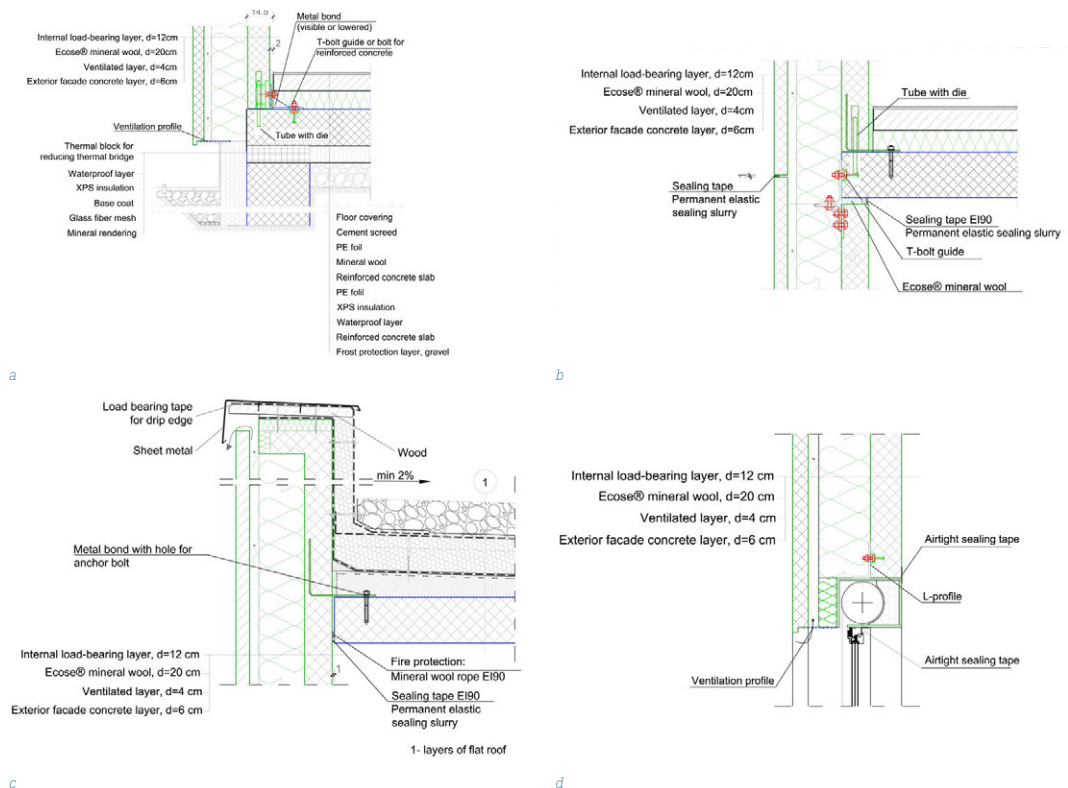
Construction details: a) Vertical section of slab foundation; b) Vertical section of intermediate floor slab; c) Vertical section of flat roof; d) Vertical section of connection with upper part of the window (detail with the roller blind box)
